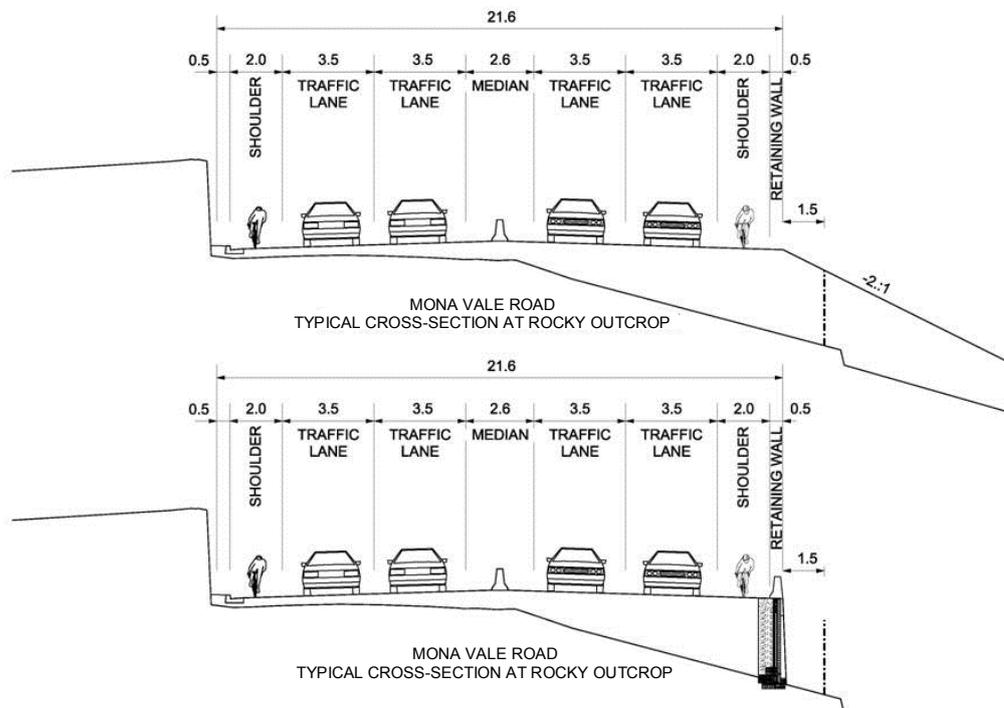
Typical cross-sections showing the benefits of a retaining wall over battered slope in the vicinity of the rocky outcrop
